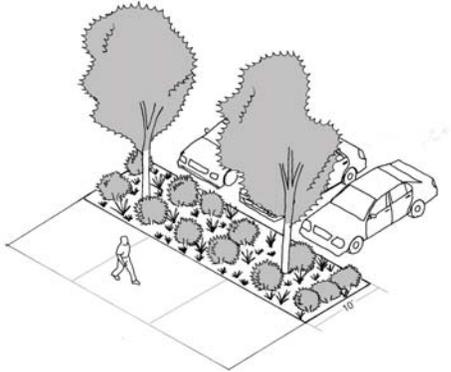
10-foot parking lot buffer with Type C landscaping.
